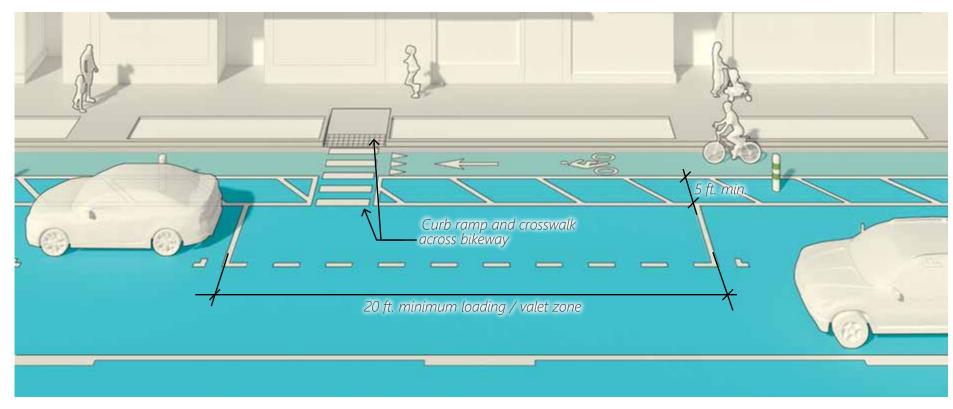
One-Way, In-Street, Class IV Bikeway, Protected by Bollards and On-Street Parking, at Loading or Valet Zone.
